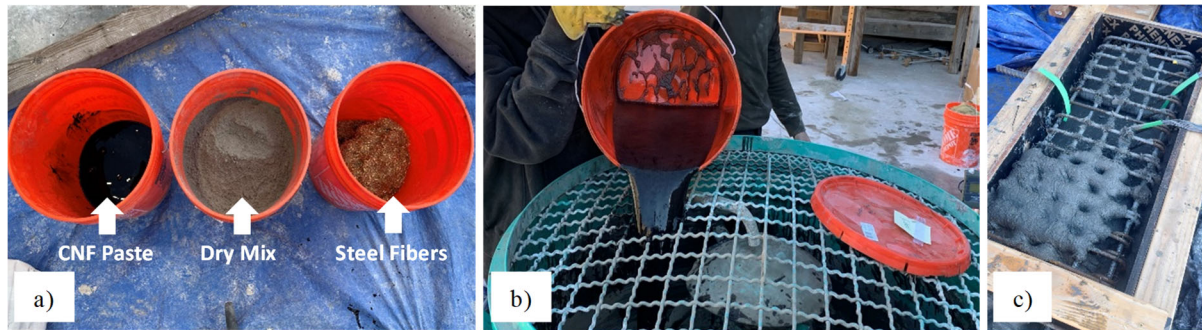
(a) CNF-enhanced UHPC ingredients, (b) adding CNF paste to mixture, and (c) casting of column
